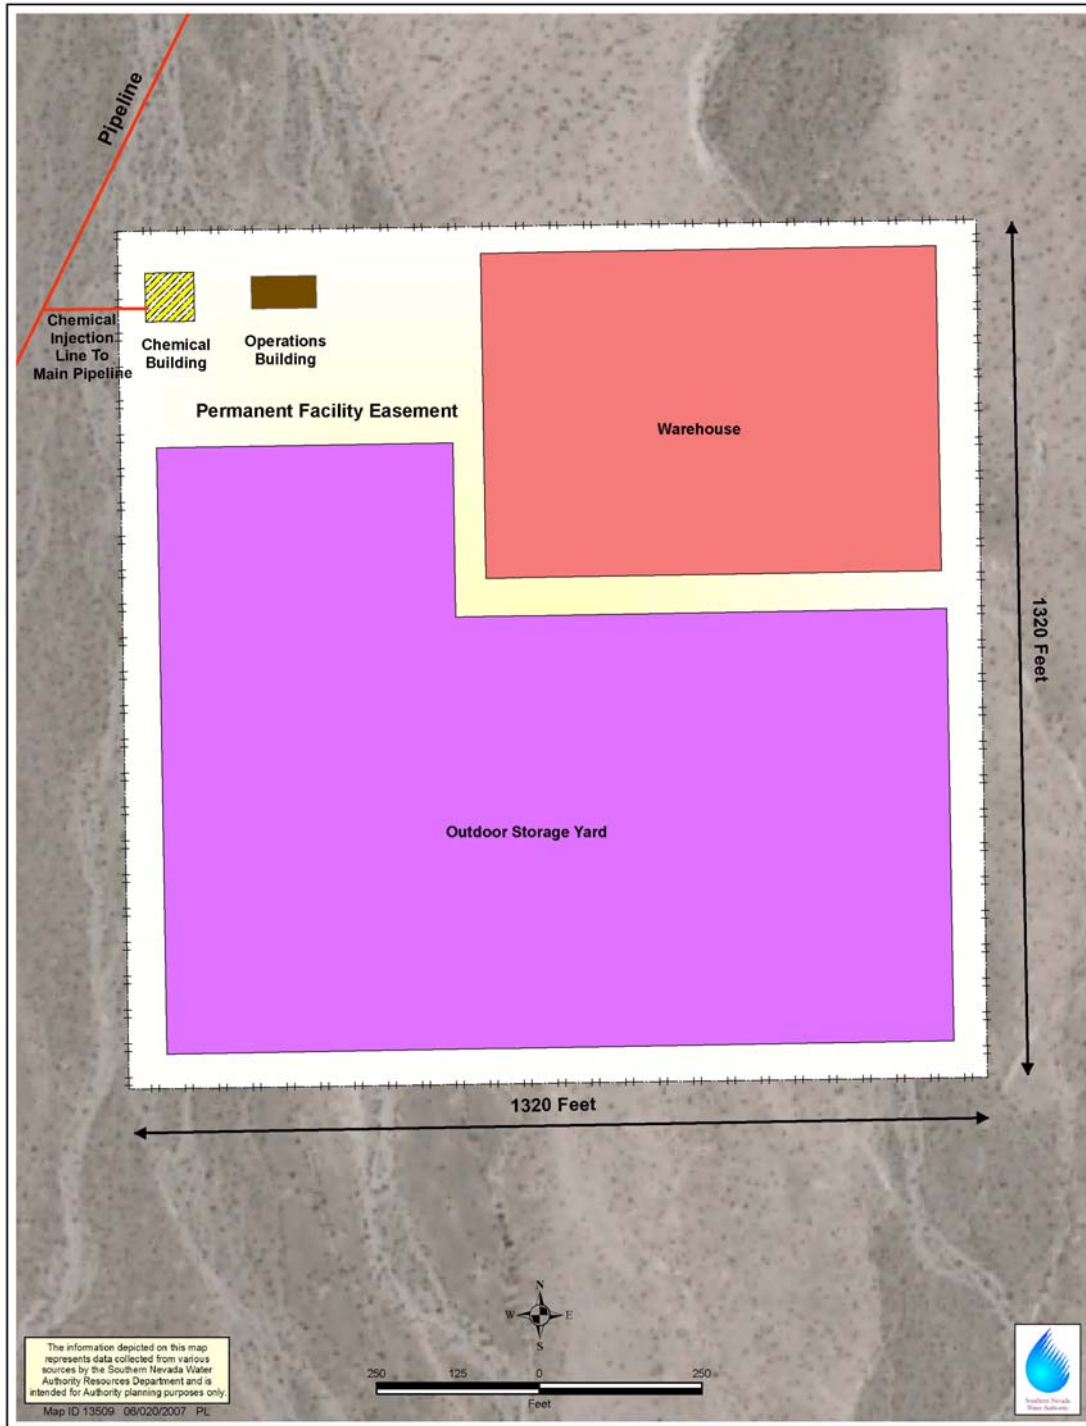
Preliminary Water Treatment Facility Site Plan
